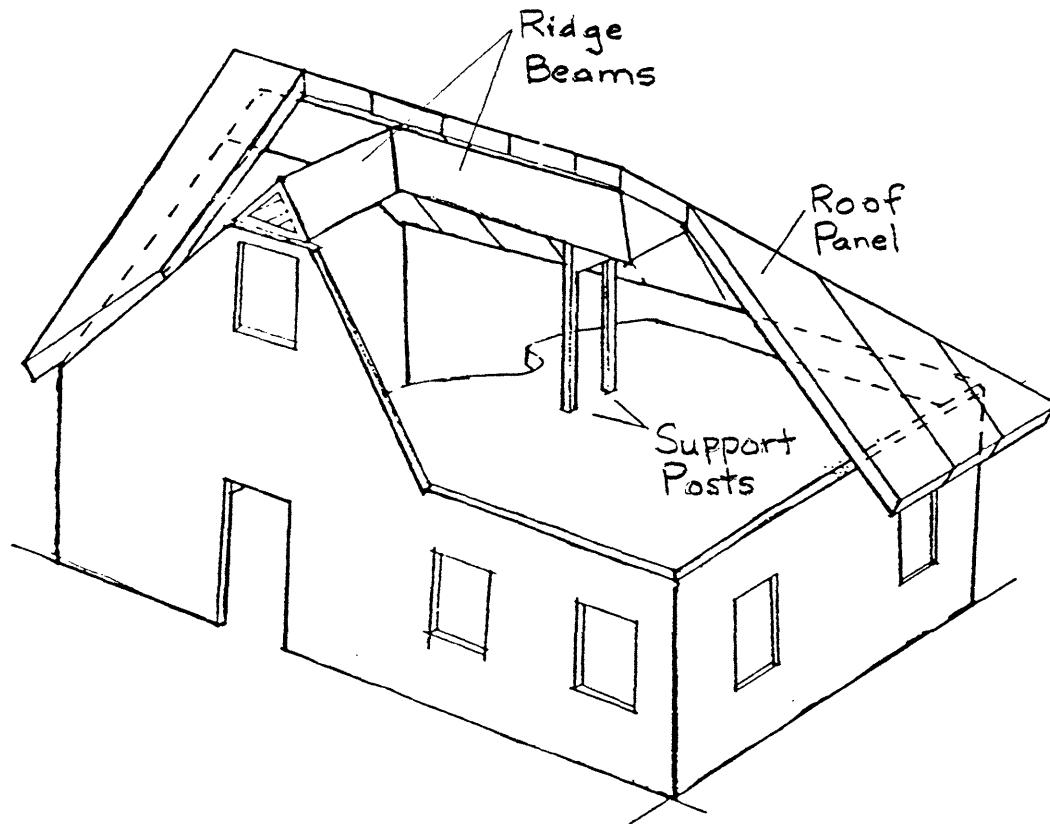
Sketch of a proof-of-concept structure that was built in Acton, Massachusetts [courtesy of the MIT Building Technology Group]. The roof panels and the ridge beams make up the MIT roof system.
